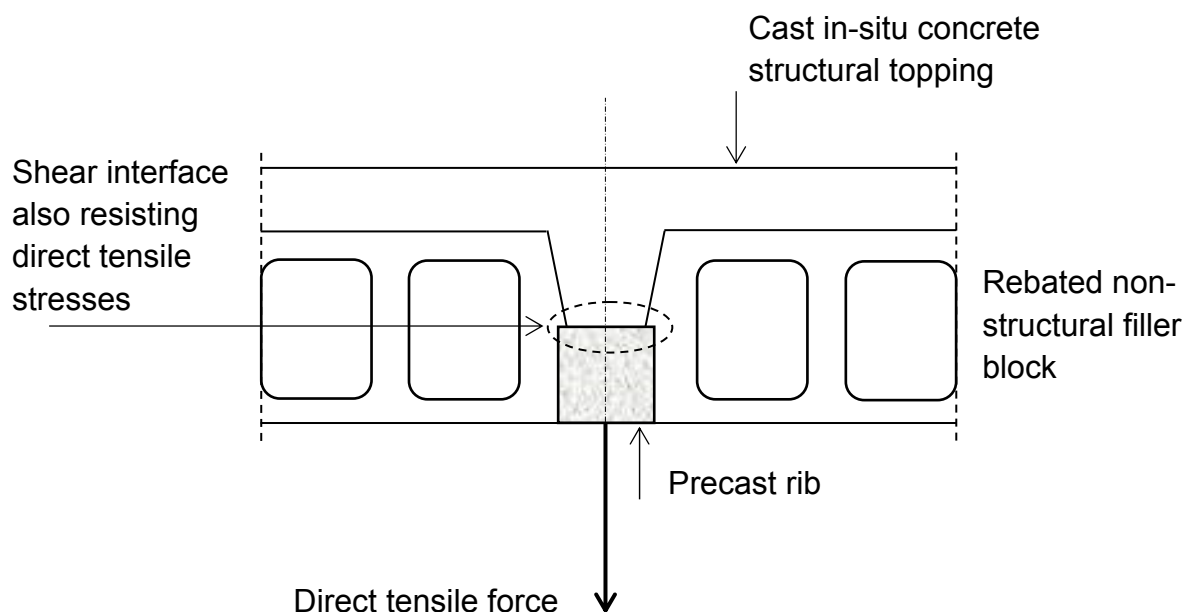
Typical section of a beam and block slab system subject to direct tension force
